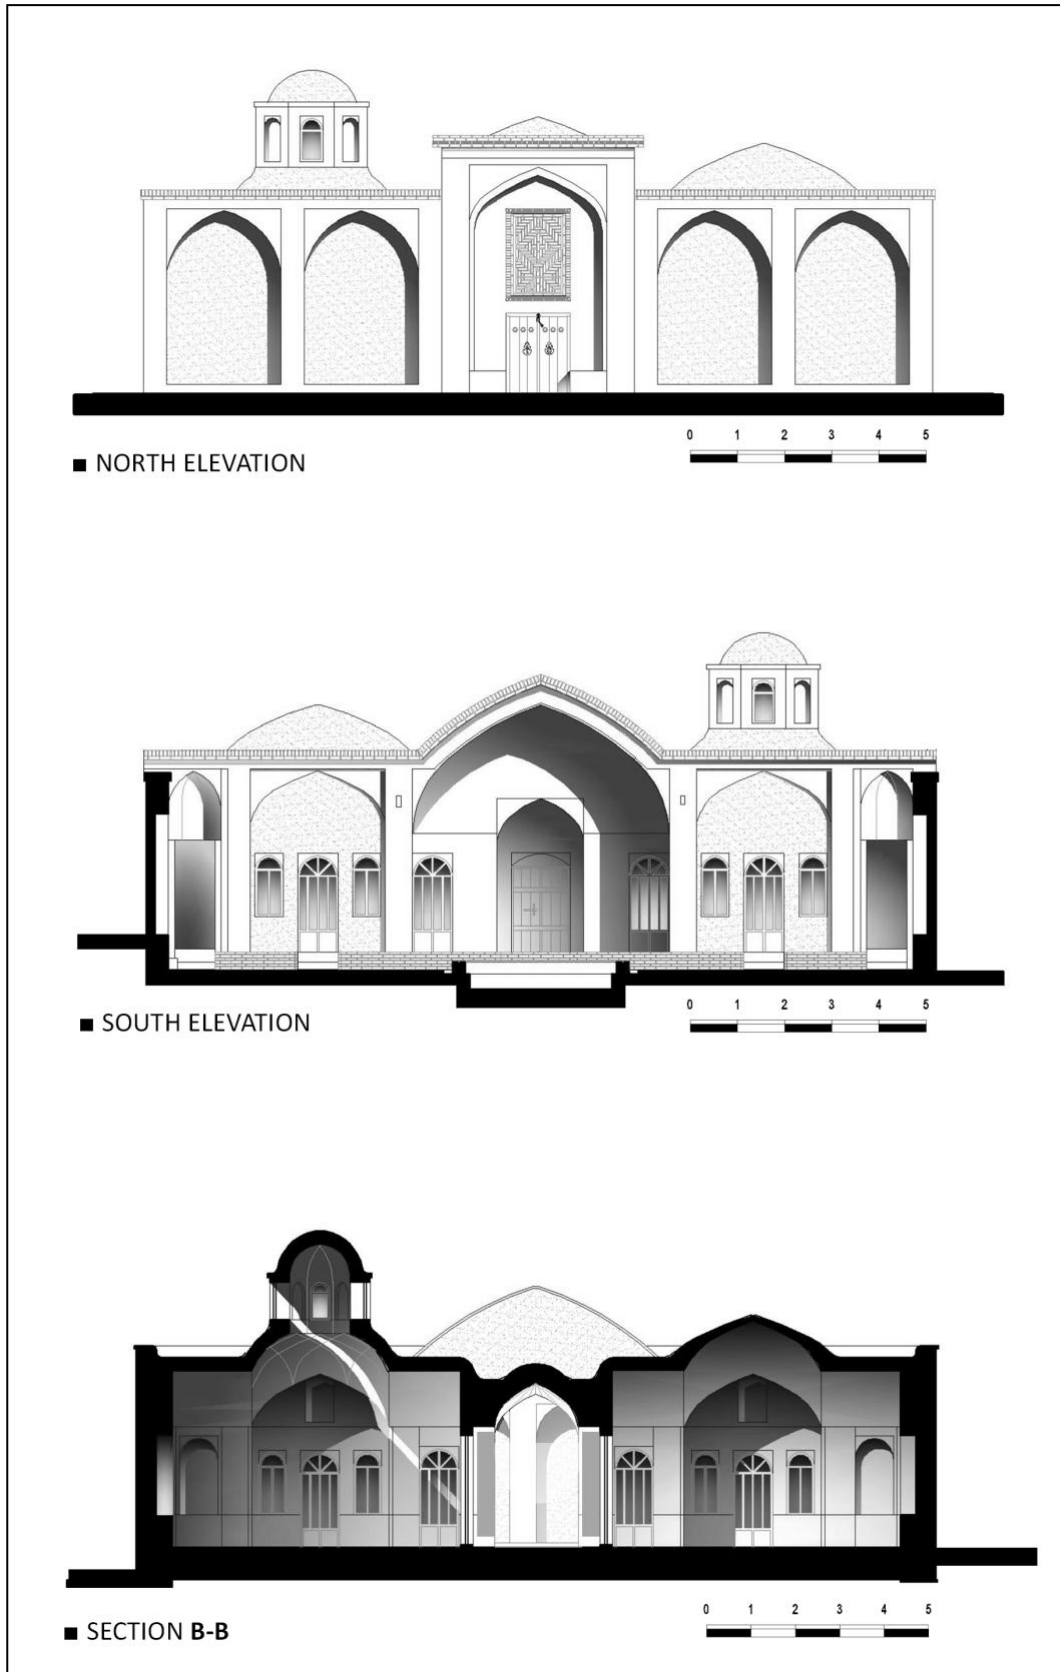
elevations and section of the Mashhadi building (Estaji, 2010)
